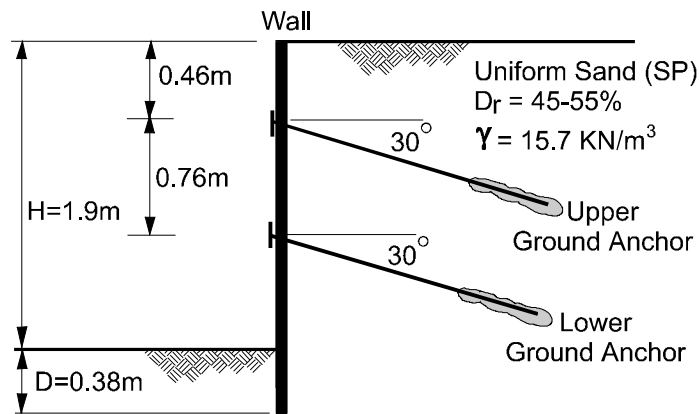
Cross section of model wall (modified after FHWA-RD-98-067, 1998).
